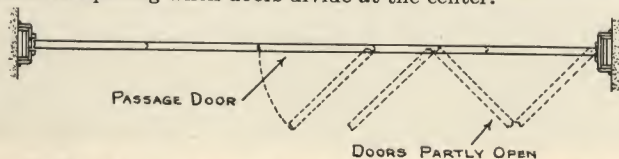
A 5-door opening showing the odd door hinged to the second door on the right. This method of providing passage door is suitable for small doors only. Notice spring jamb at the left.
